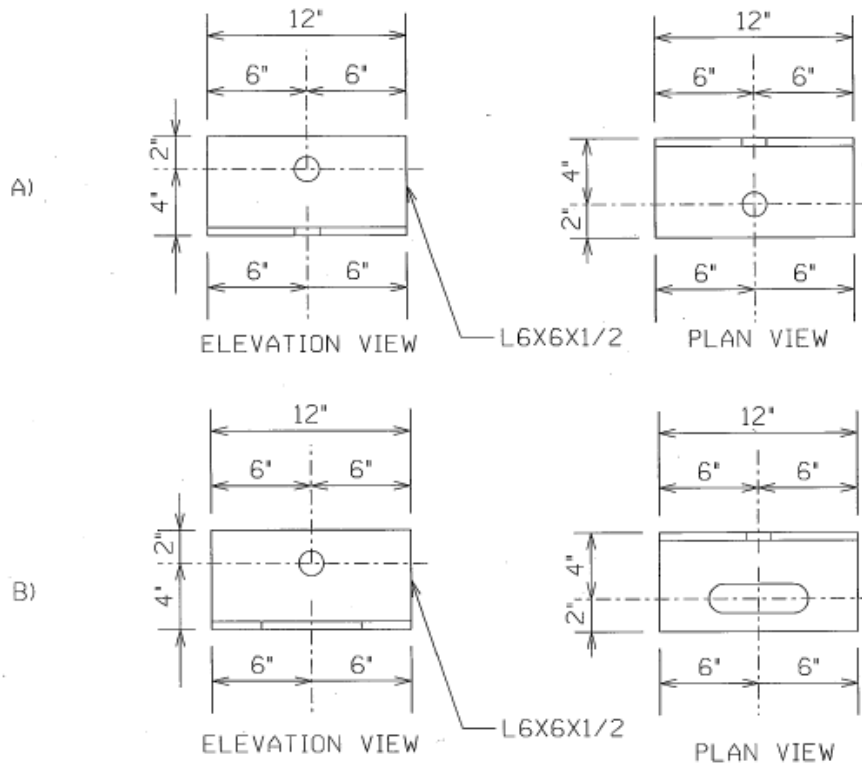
Little Bear Creek Bent 2 & 3 Connections for Type III Girders
